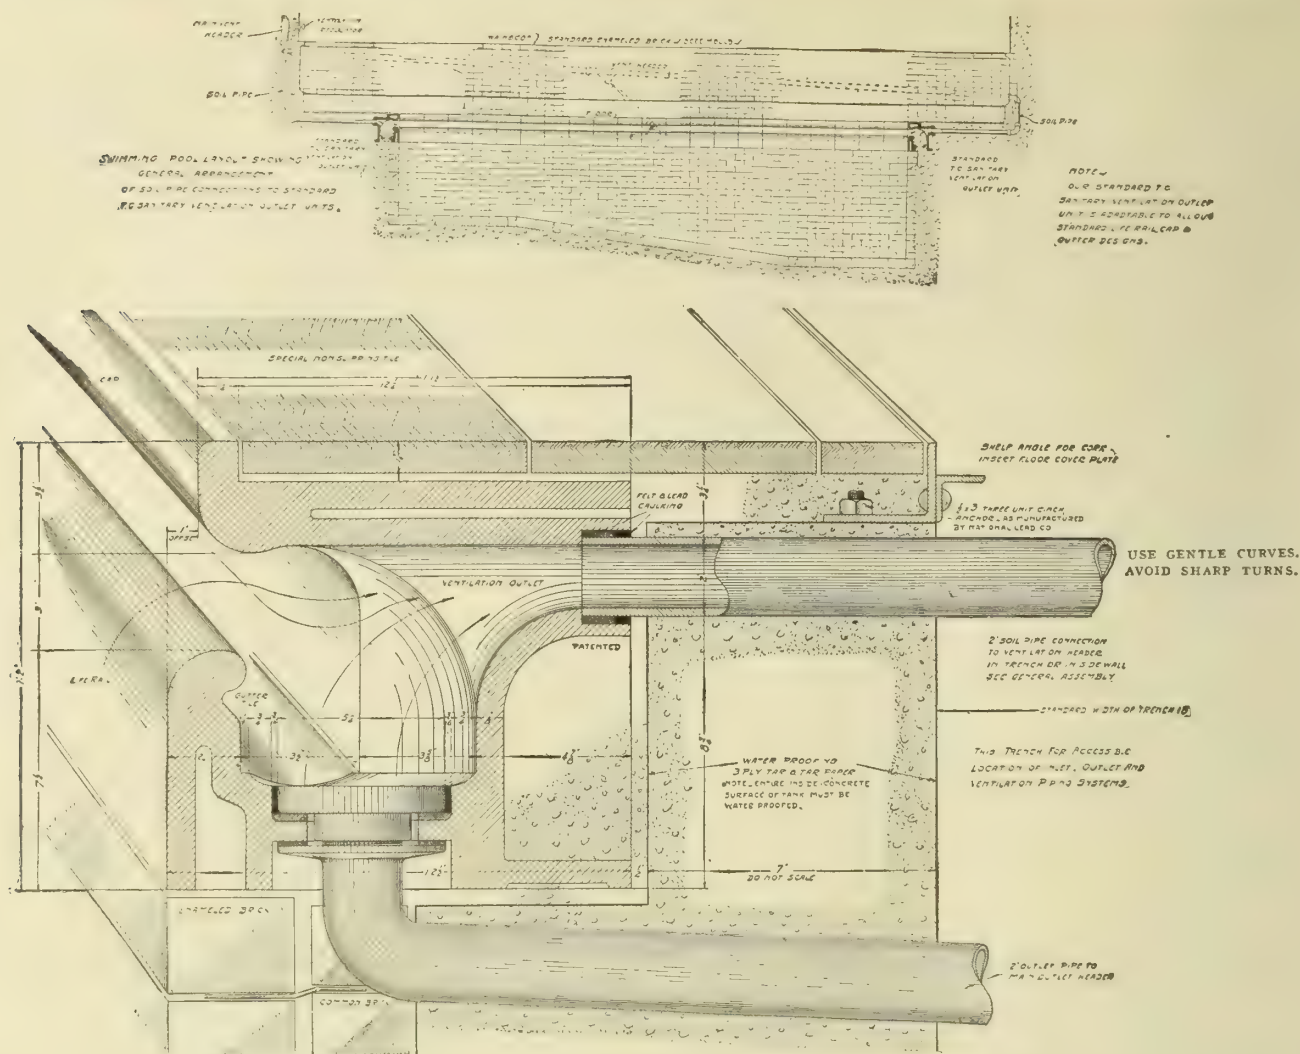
1915 MODEL DESIGN NO. 6250. TERRA COTTA VENTILATION OUTLET UNIT SECTION, WITH OFFSET CAP (PATENTED)
